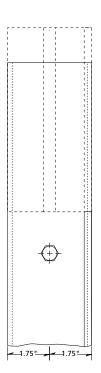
DETAIL A POST/WOOD RAIL ASSEMBLY FRONT VIEW
